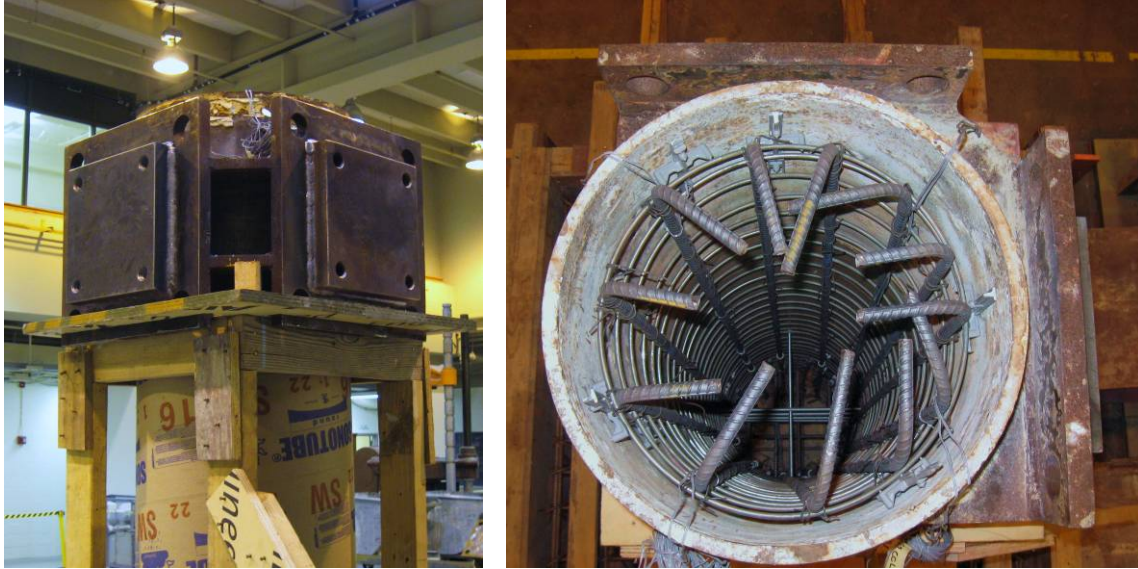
(a) Installed steel jacket connecting the column top to the actuators; (b) Spacers used between column cage and formwork or steel jackets
